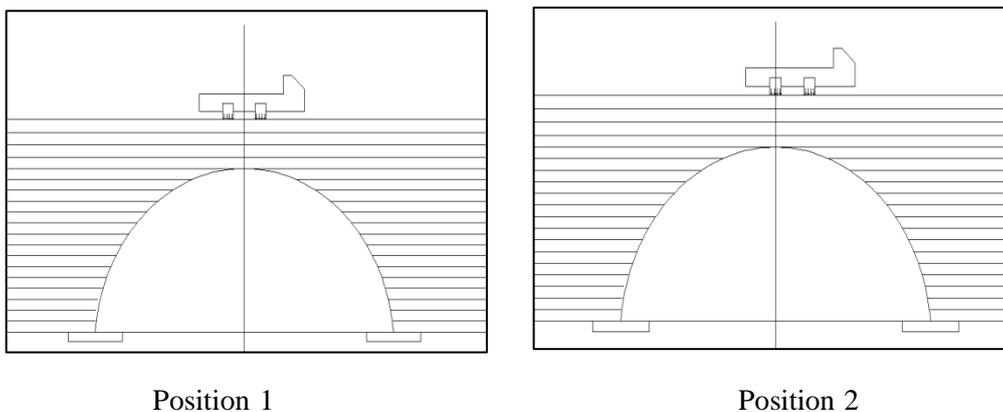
Geometry of arch culvert with 1m vertical concrete pedestals
